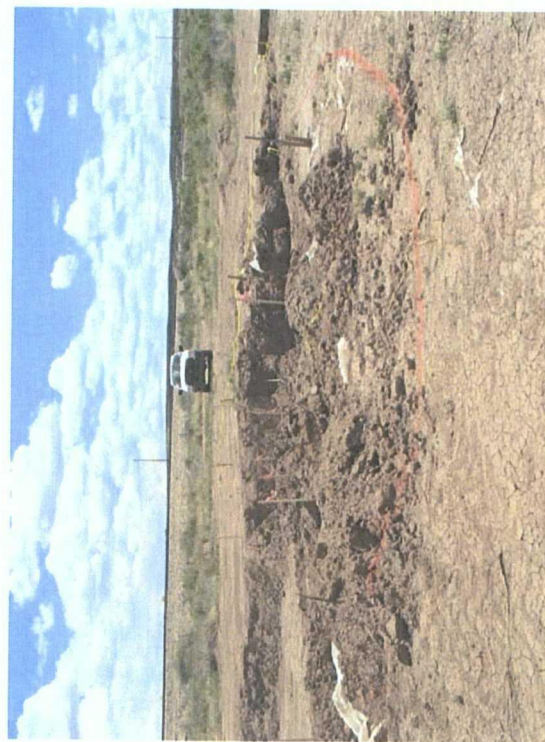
Excavation pit looking East showing excavation area for CS-22 through CS-24
